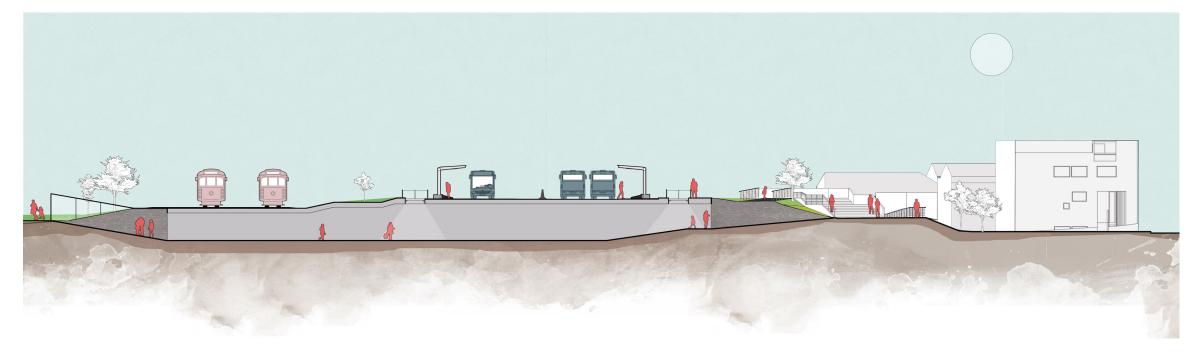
Cross Section Showing a Potential Bridge Under the Busway and Railroad
